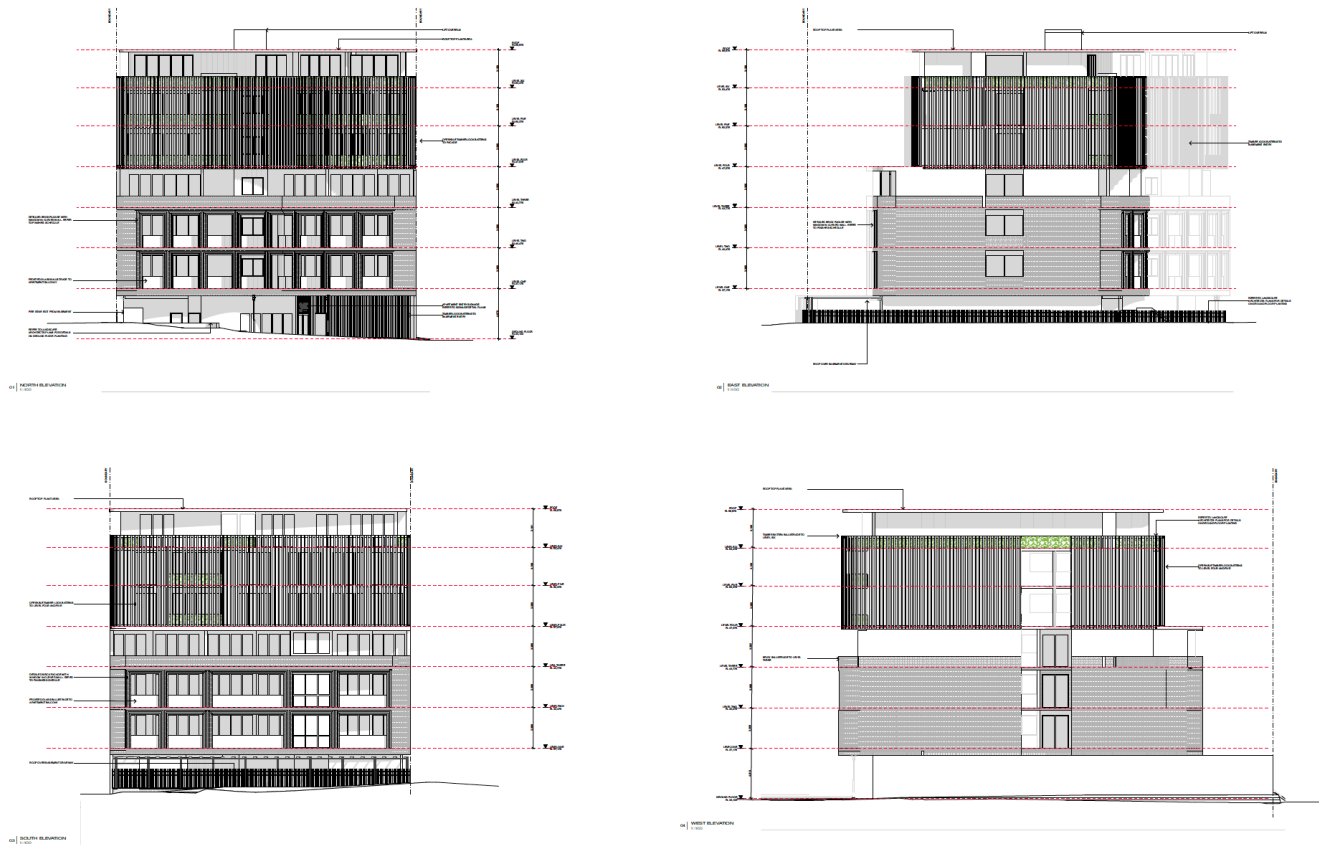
Proposed elevations of the Building B development. Source: IDG, Drawing number DA-2001, 'Elevations Stage A,' Issue I.
